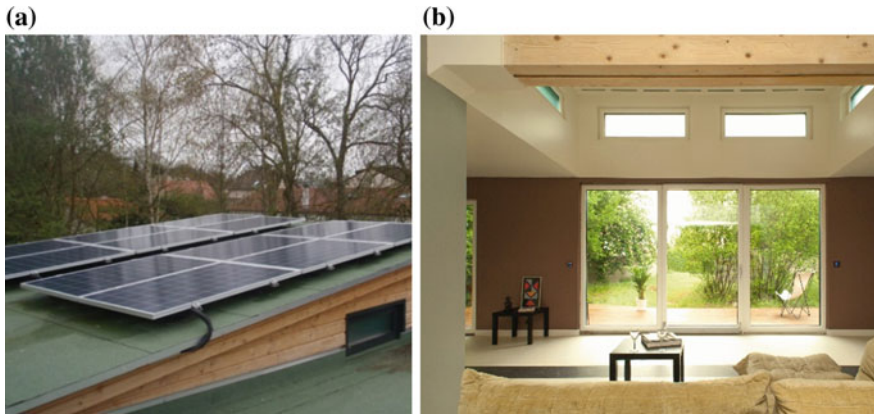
Vermont House: a 3 kW PV panels on the elevated roof and b Windows facing South are the main radiators of the house
